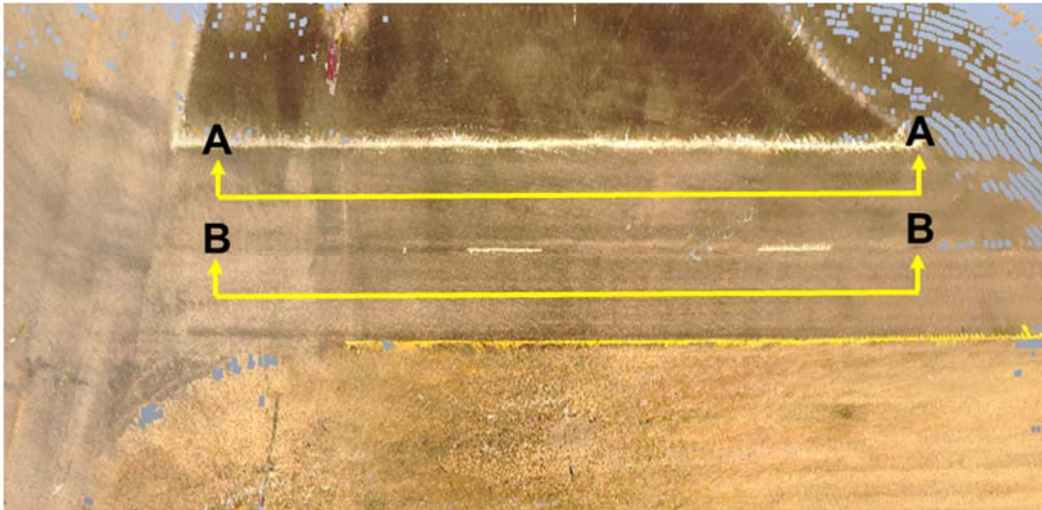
Elevation monitoring section of pavement of the U.S. 75 Frontage Road
